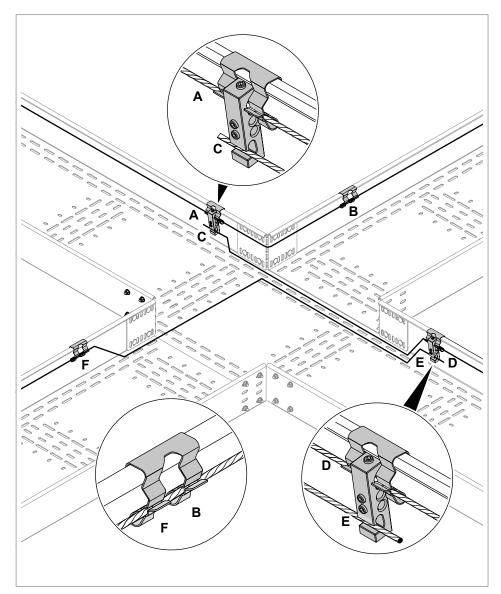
BKRS, mounting of conductor cross-over, double connection terminal
